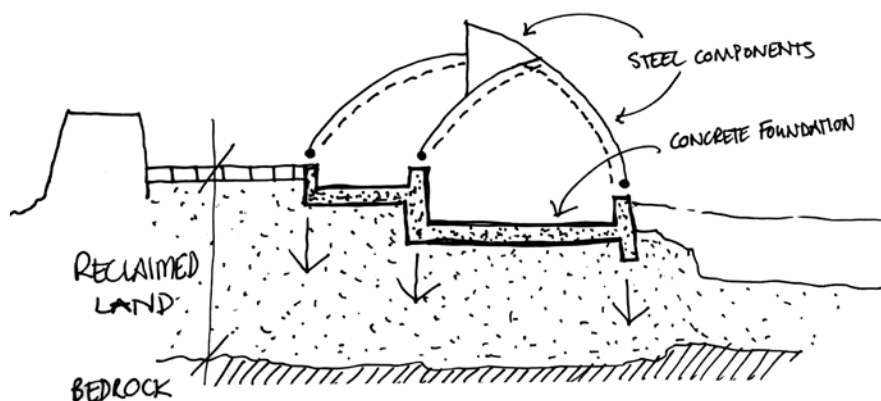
Early sketch of the basic idea behind the foundation of the museum. The foundations and floor slabs are mimicking the surfaces around the old wall, and the large 4m x 2m x 1.5m concrete blocks are also used throughout the lower levels as the same language of the exterior terrain is drawn in through the building.
